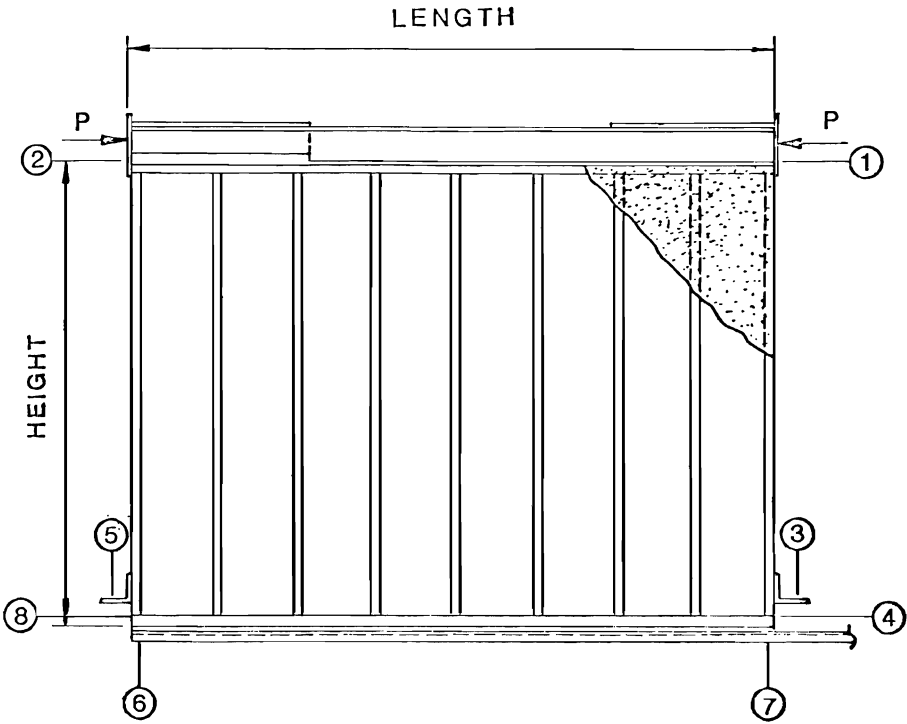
ASTM E564 Wall Assembly Dial Gage Locations
